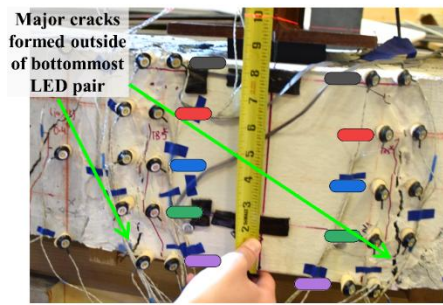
Measured LED joint opening and joint cracking of specimen Slab-SL-UH1
